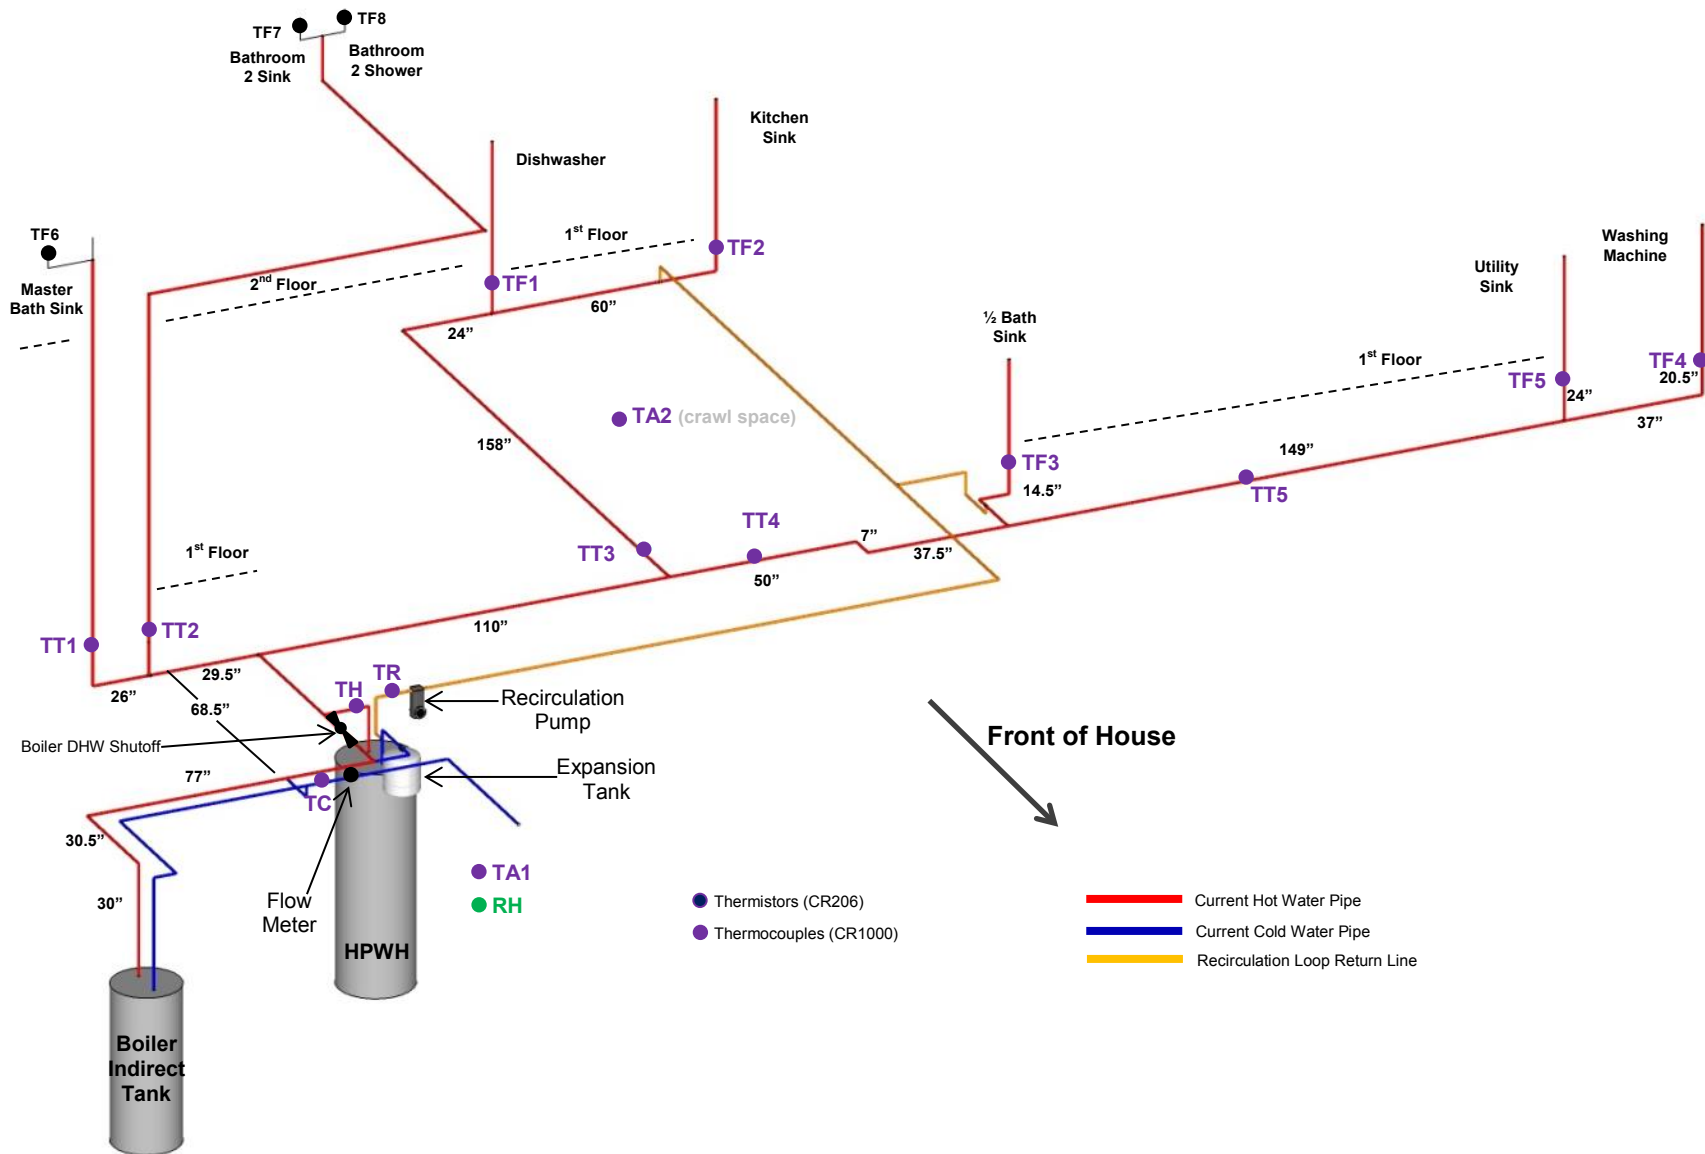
Site 1 pipe layout, pipe length, and sensor location
